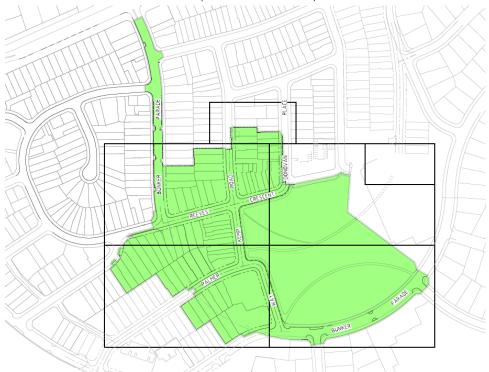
STAGE 5 LOCALITY PLAN (HYDER CONSULTING)
